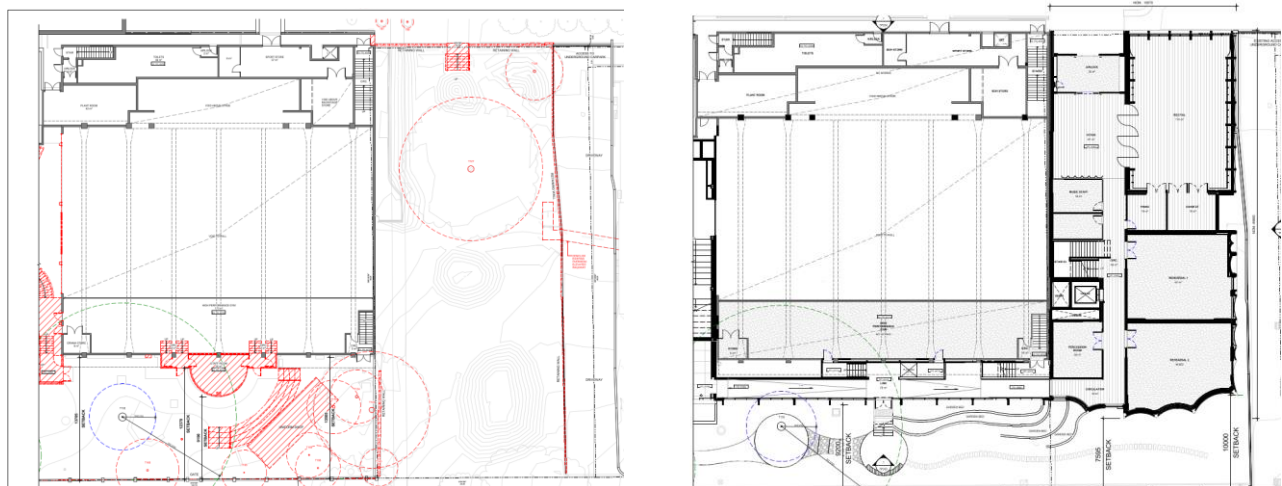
Dorothy Pizzey Centre (existing left) and ground floor Music (right)
